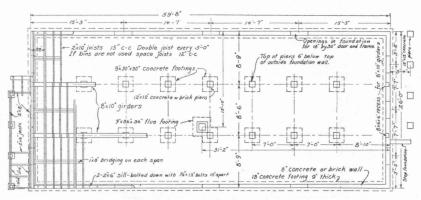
Foundation plan of 26x60 foot sweet potato storage house.
